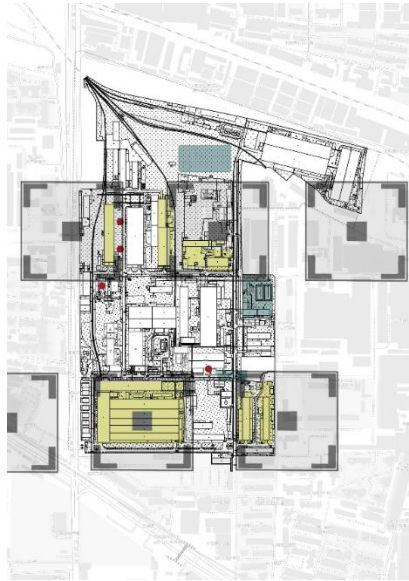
Overlay of Wang Mang Jiu Temple Site and China Steel Plant Site. Source: By Author.
